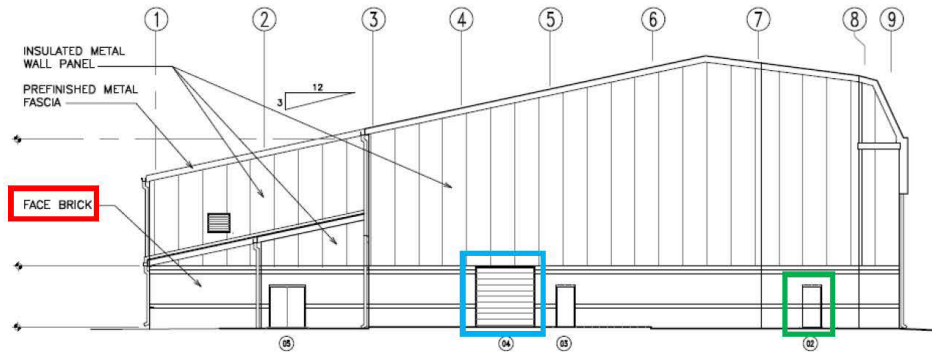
Image showing the proposed configuration of the southwest elevation. The note indicated in red, which is shown on the 35 percent design plans, indicated that brick veneer would be installed; however, that design element has been removed to avoid impacts to the historic property. The roll-top door indicated in blue, and the single-leaf door indicated in green would be added.
